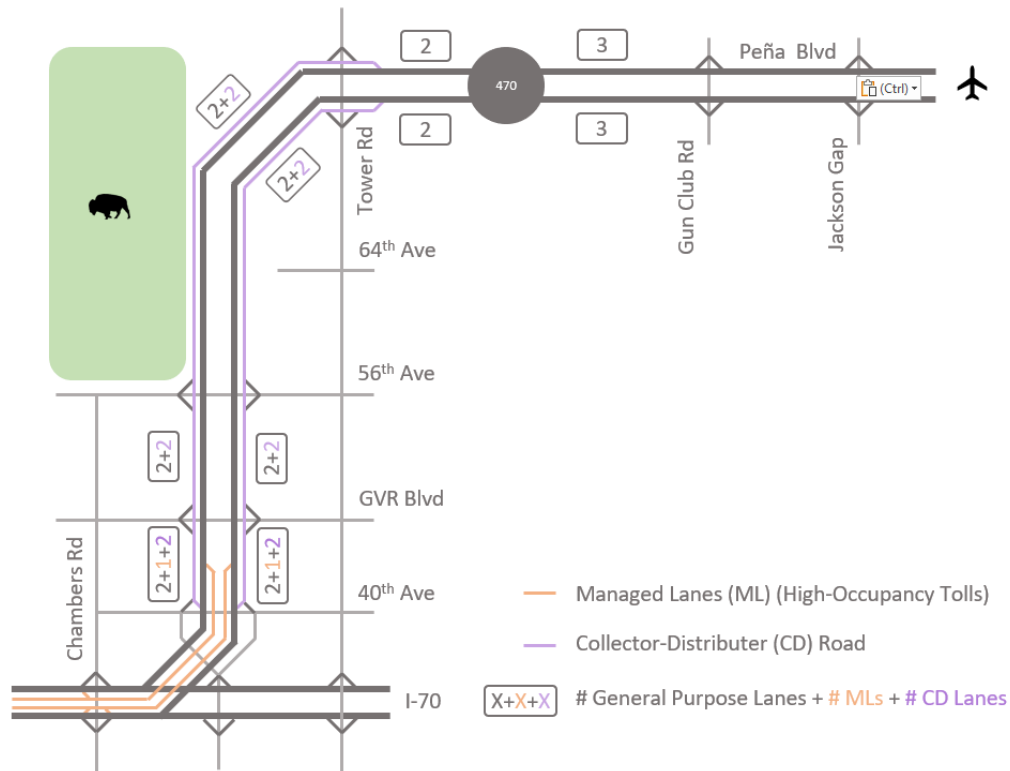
Two Lane C-D Roads Between 40th Avenue and Tower Road
